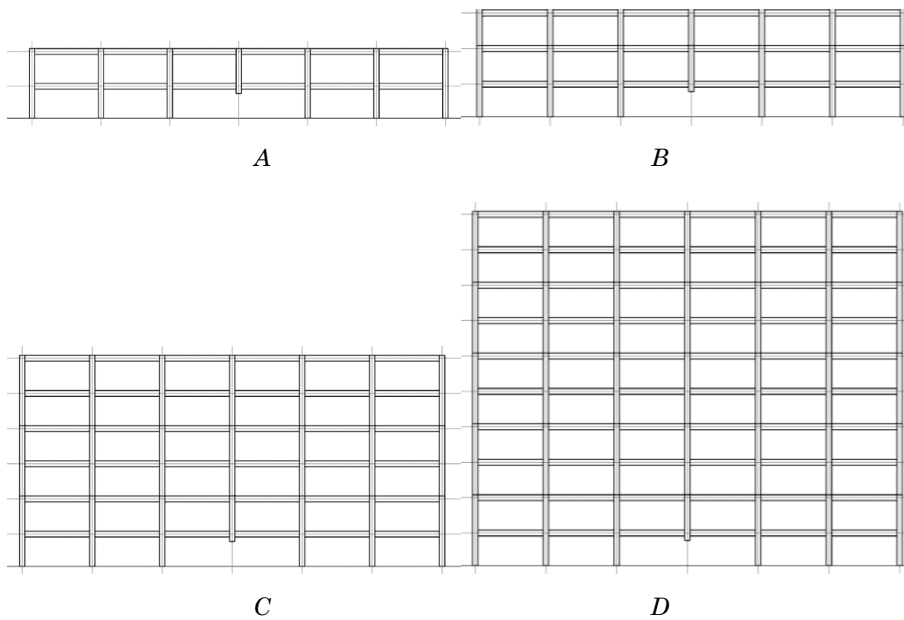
Model A: two floor, six bay frame; Model B: three store and six bay frame; Model C: six storey and six bay frame; Model D: ten storey and six bay frame
